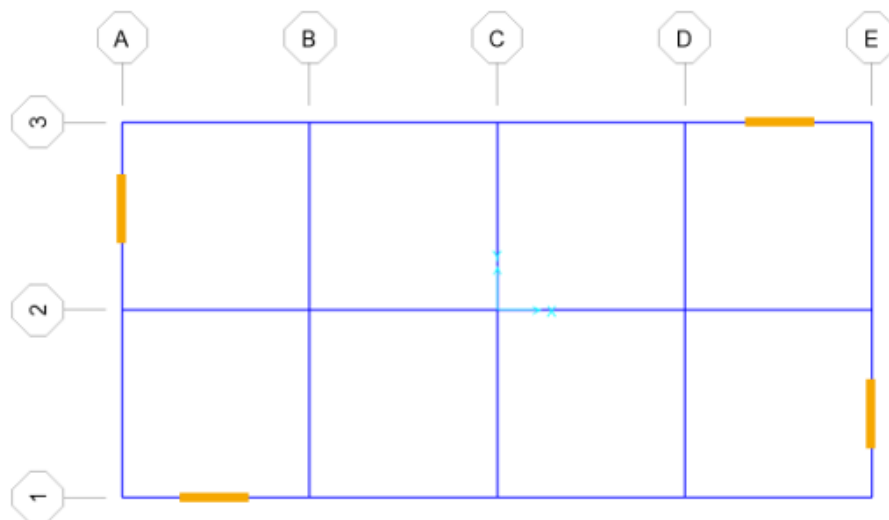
Positioning of the shear walls (yellow segments) in plan view.
